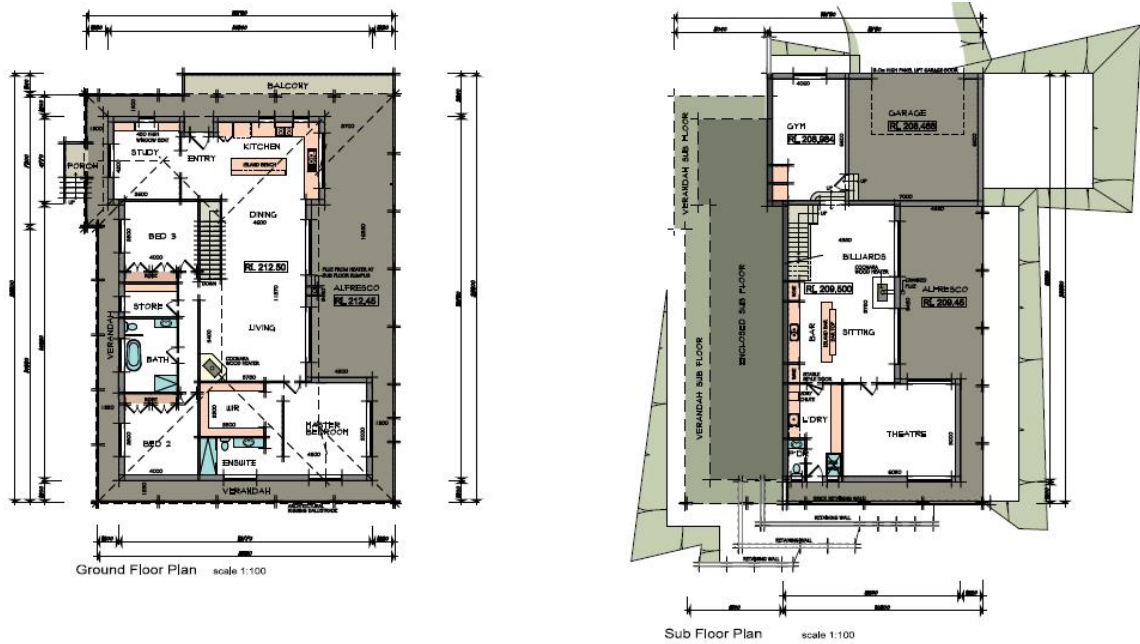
Floor Plan (left) and Sub Floor Plan (right).
